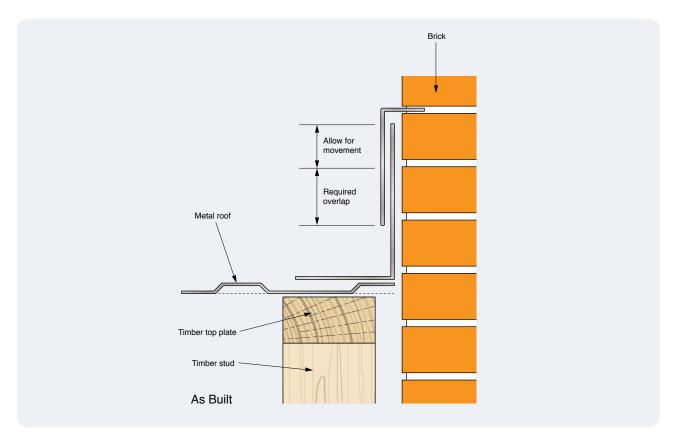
Flashing design for greater over lap to accommodate axial shortening.
